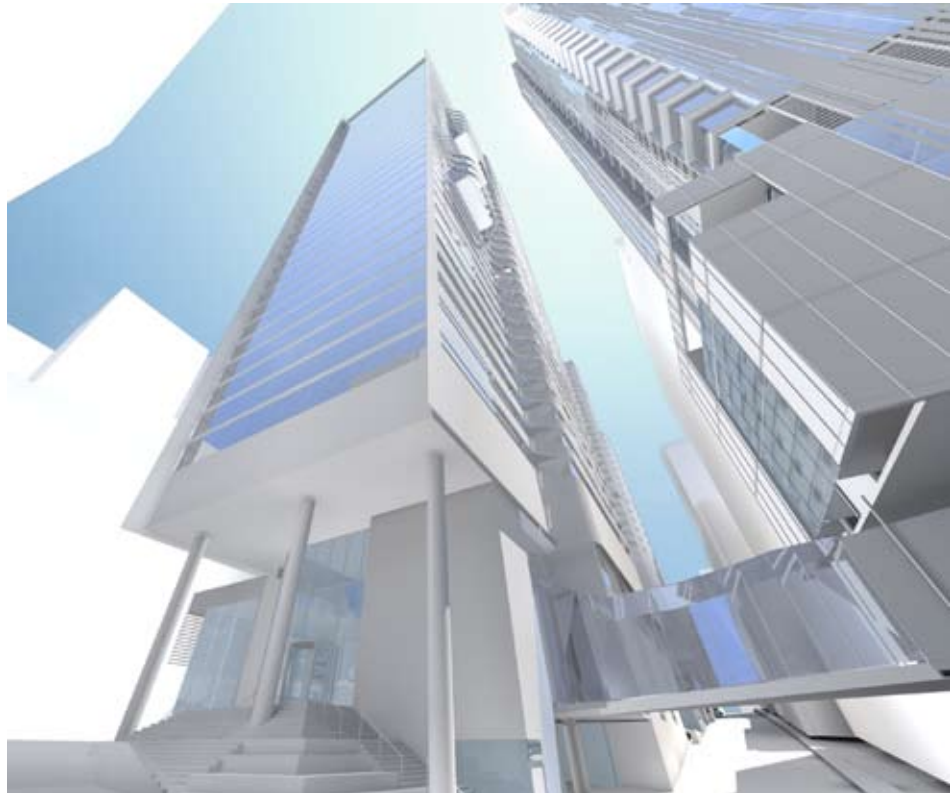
Proposed pedestrian bridge over Little Spring Street
